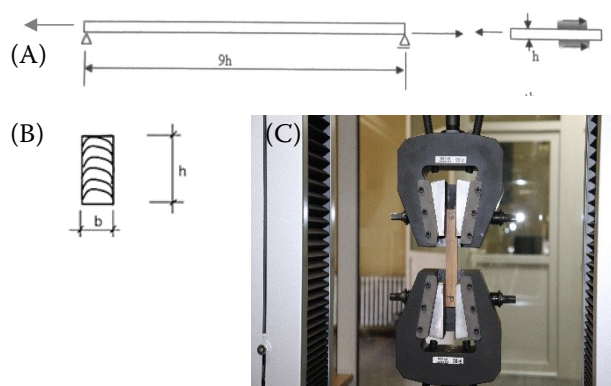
Mechanical tests: (A) Tensile test and dimensions of samples of rectangular cross-section b/h , (B, C) Tensile testing on Shimadzu testing machines (BAS EN 408)
